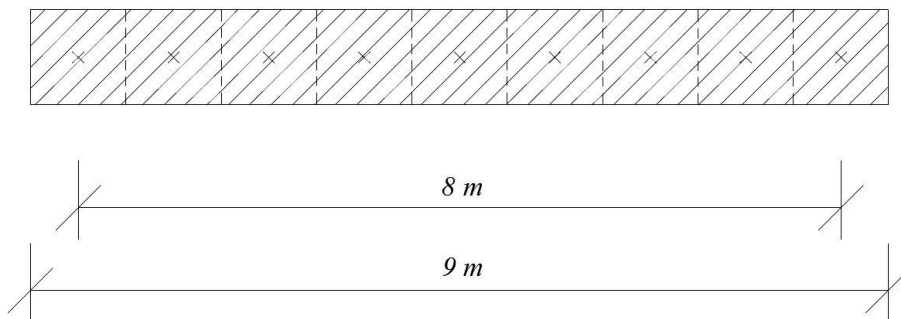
Cross-section of the slab modelled as a beam grillage.
